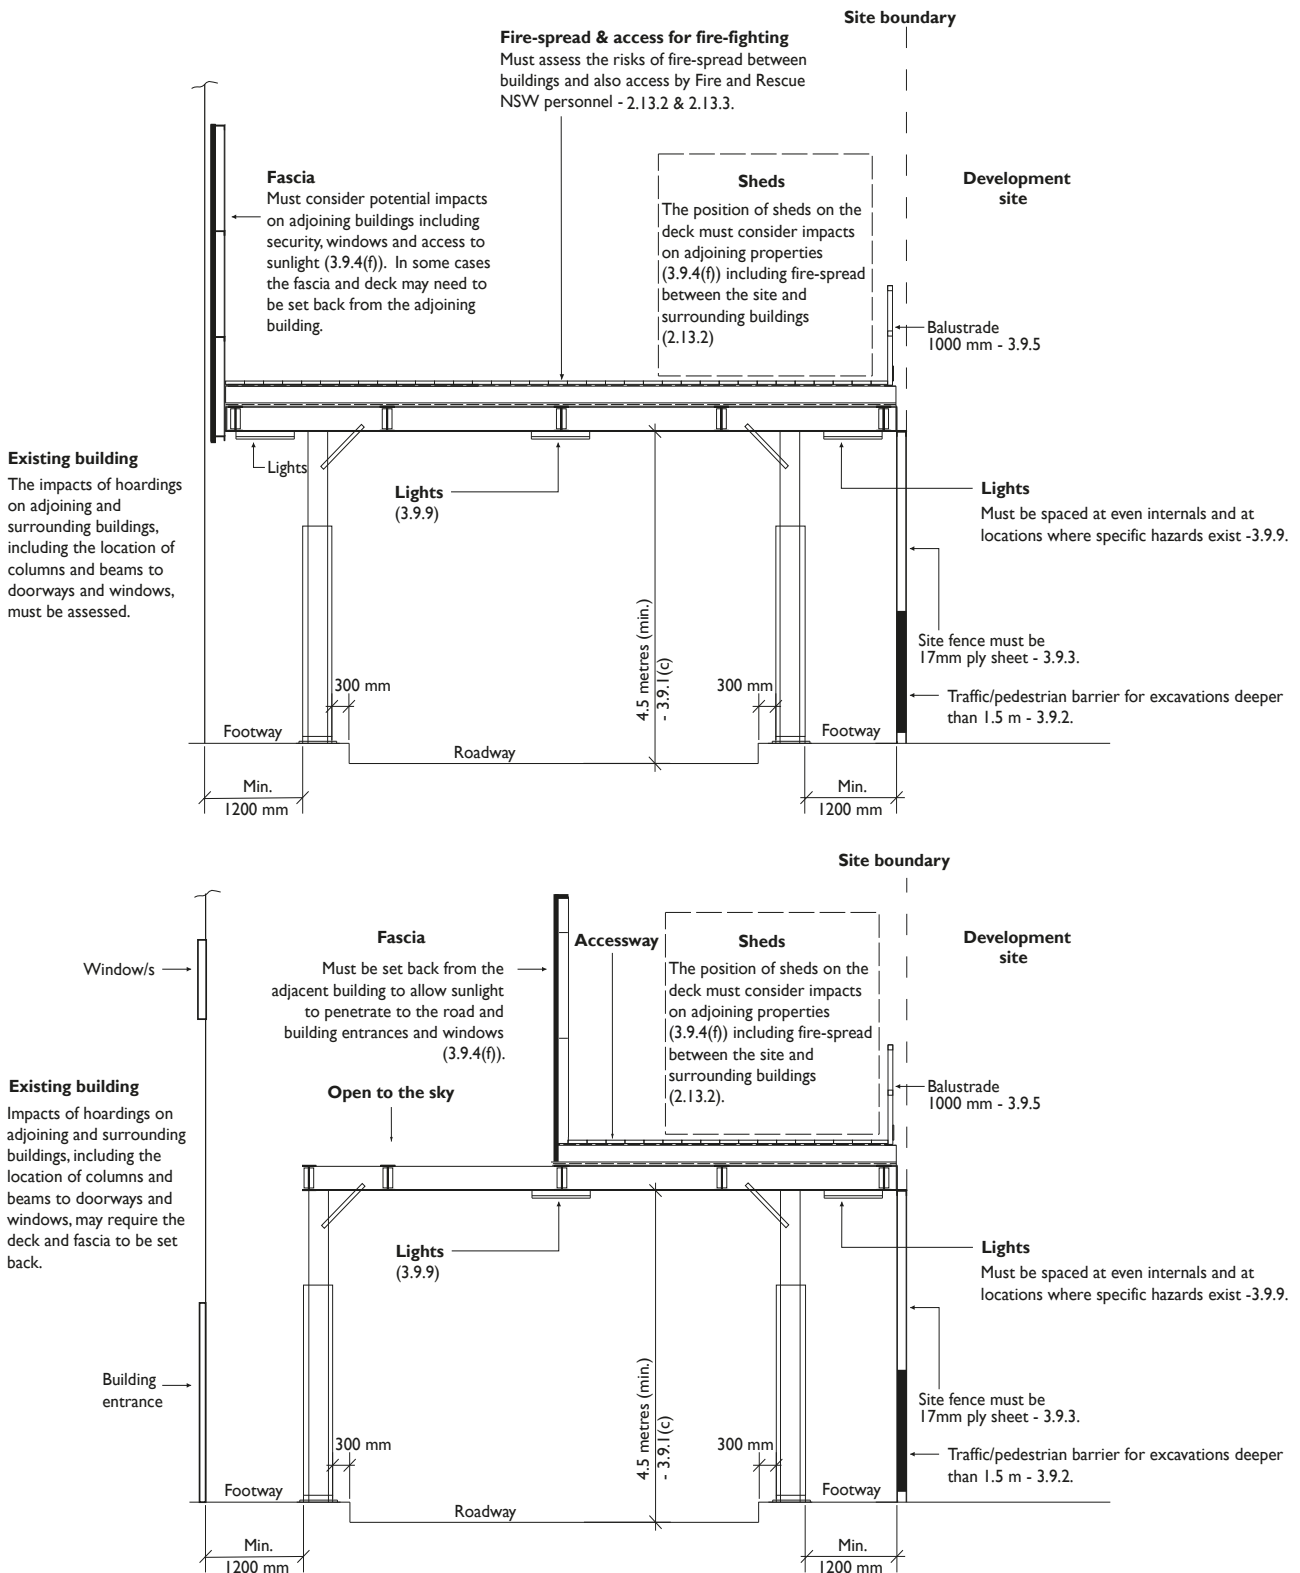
(a) (top): Section detail of a 'Type B' hoarding erected over a roadway. Potential impacts on adjoining properties and on vehicles including vehicle access to driveways must be considered in the design.
